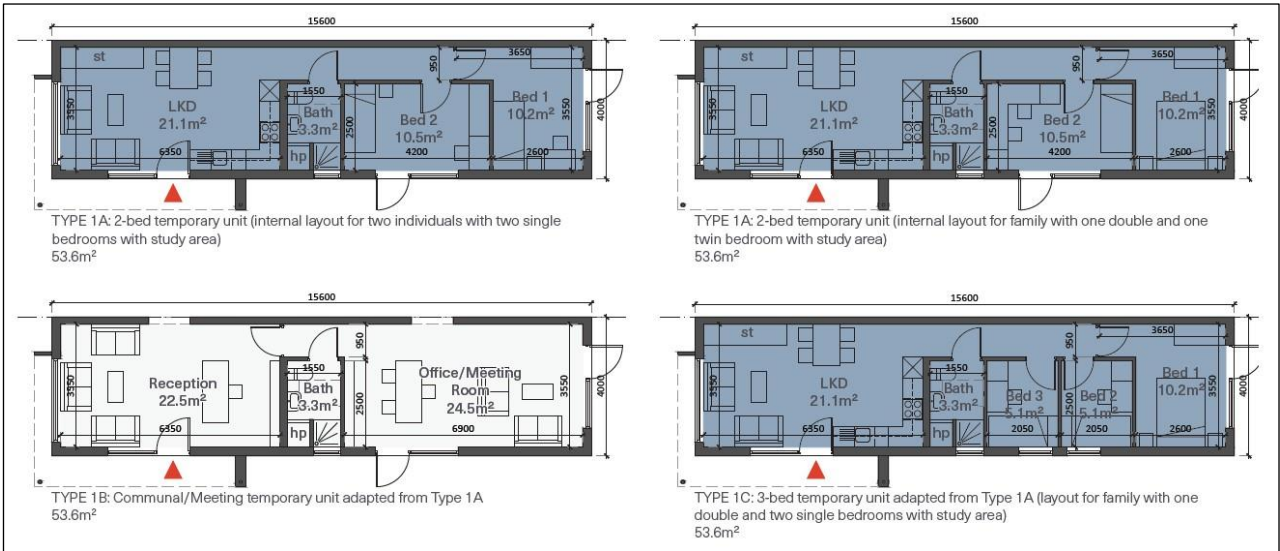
Modular unit plans (Source: O'Mahony Pike Design Statement, 2024) (1/2).
